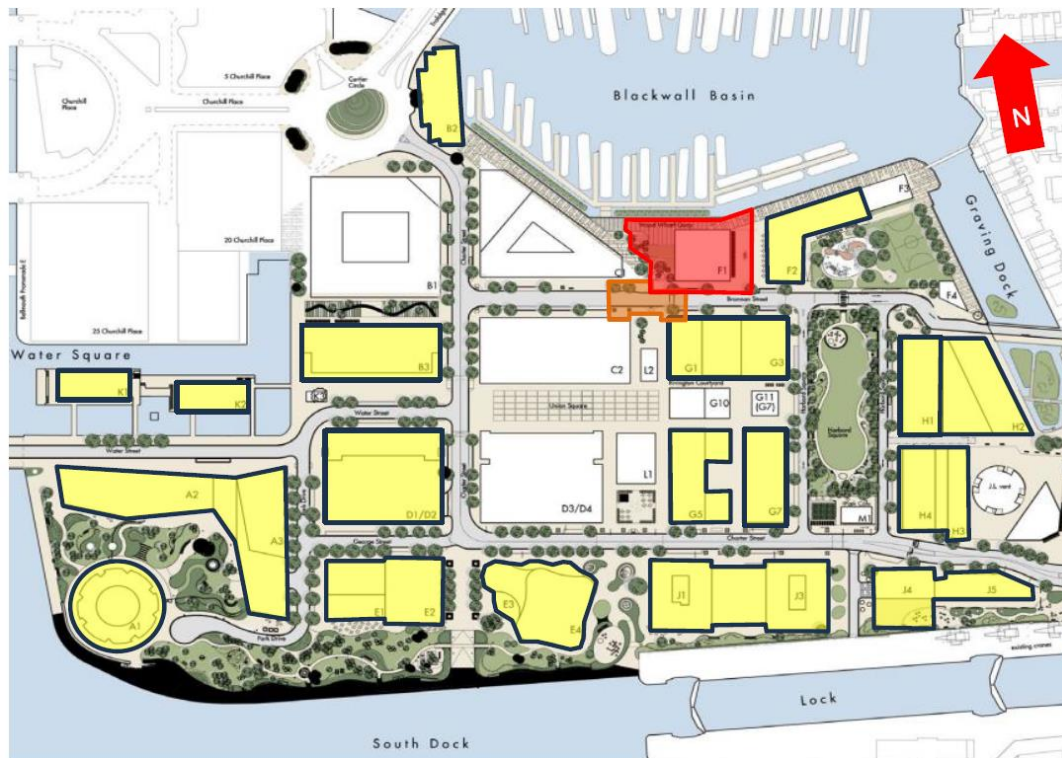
Application site identified red, buildings built or under construction that form part of Wood Wharf Masterplan identified in yellow.
